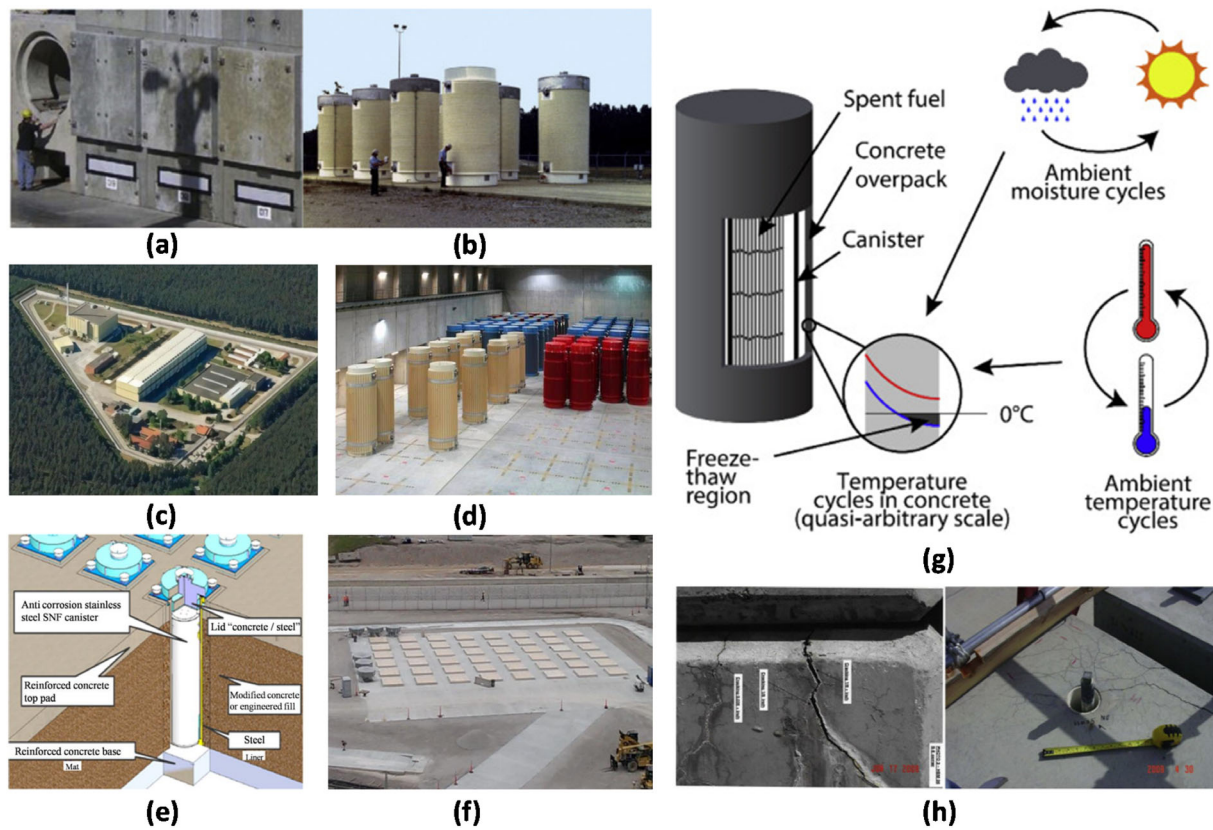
Nuclear waste and disposal facilities and fact, (a) horizontally oriented concrete dry casks, and (b) oriented vertically,¹⁵⁹ (c) Gorleben interim dry storage facility site view, (d) an interior view that shows arranged vertical CASTOR casks stored indoor in the same facility,¹⁶⁰ (e) HI-STORM Underground MAXimum Storage (UMAX) design features, (f) the site view of Callaway Nuclear Power Plant (NPP) UMAX Facility in the United States (Source: adapted from Ref. 161), (g) Environmental conditions and cycles affecting concrete dry casks,¹⁶² and (h) Observed cracking of concrete dry casks on Three Mile Island.¹⁶³
